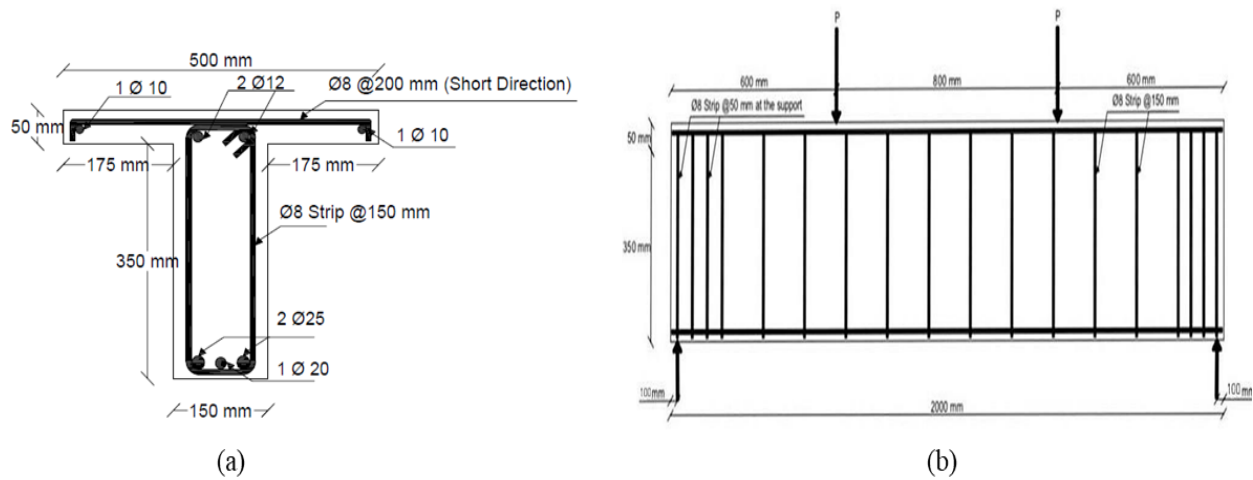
Section details and reinforcement; (a) cross-section; (b) longitudinal section.
